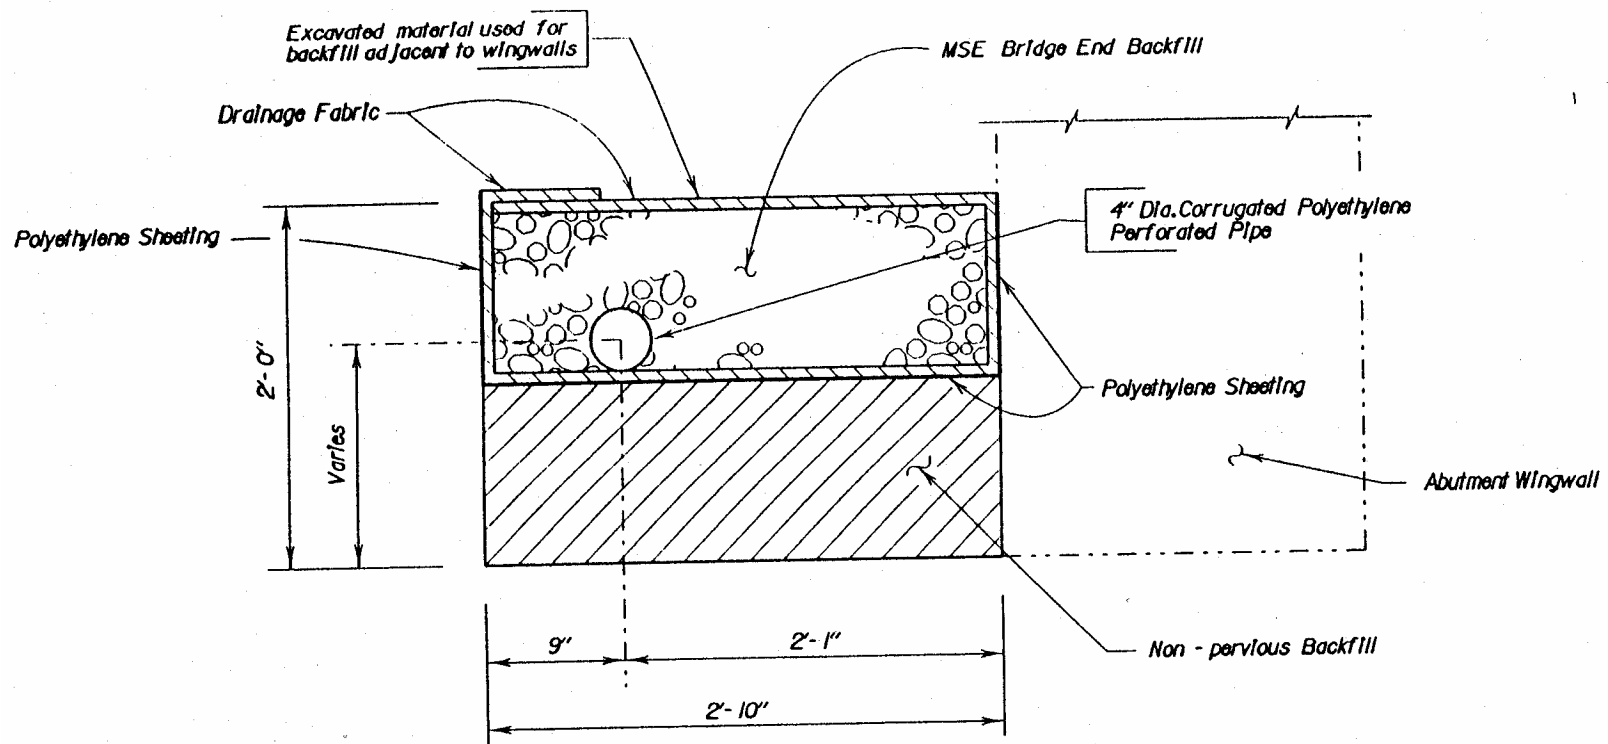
Design detail showing the drainage system behind the wing wall sections of the embankment
